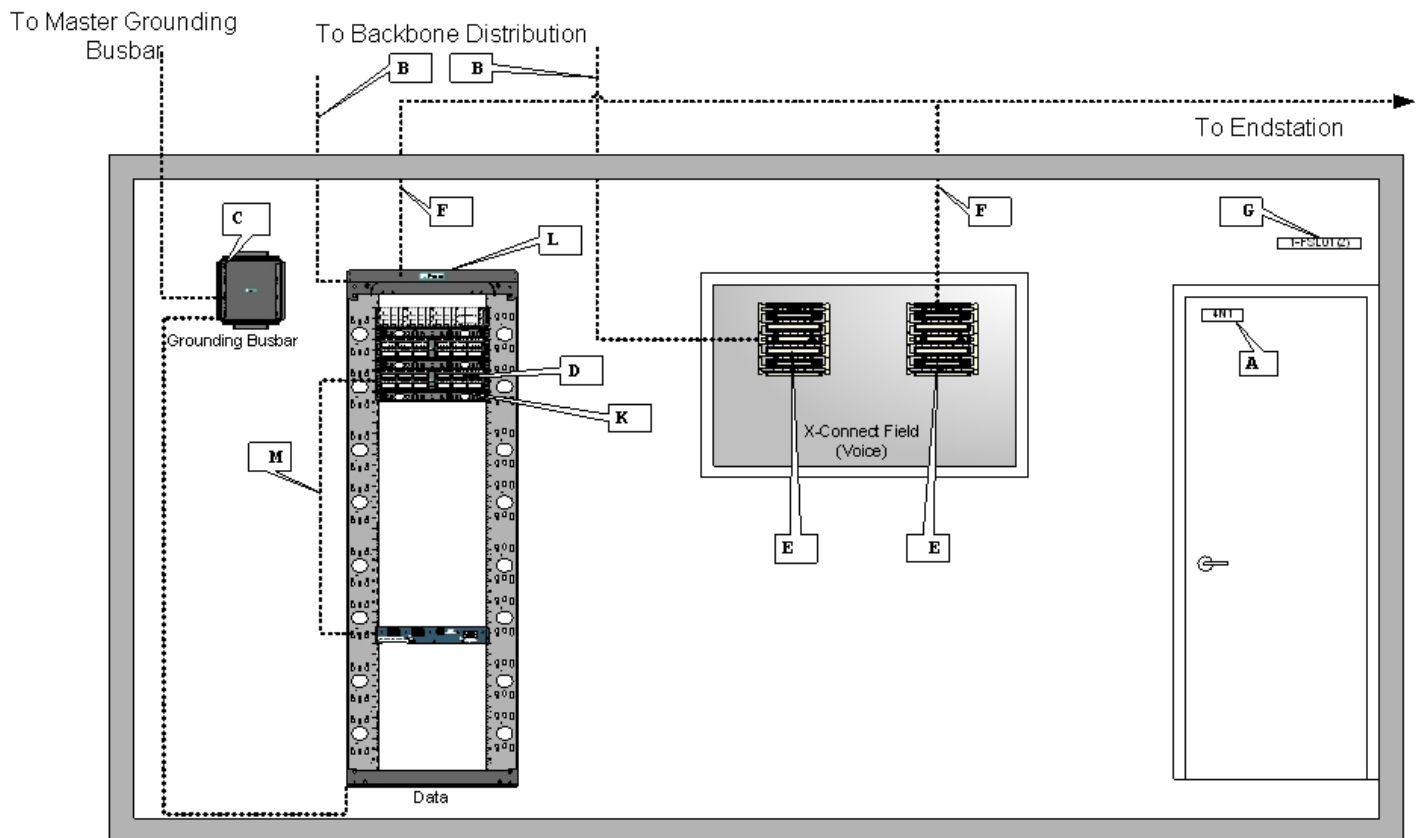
TR, Equipment/LAN Room Labeling Guideline
